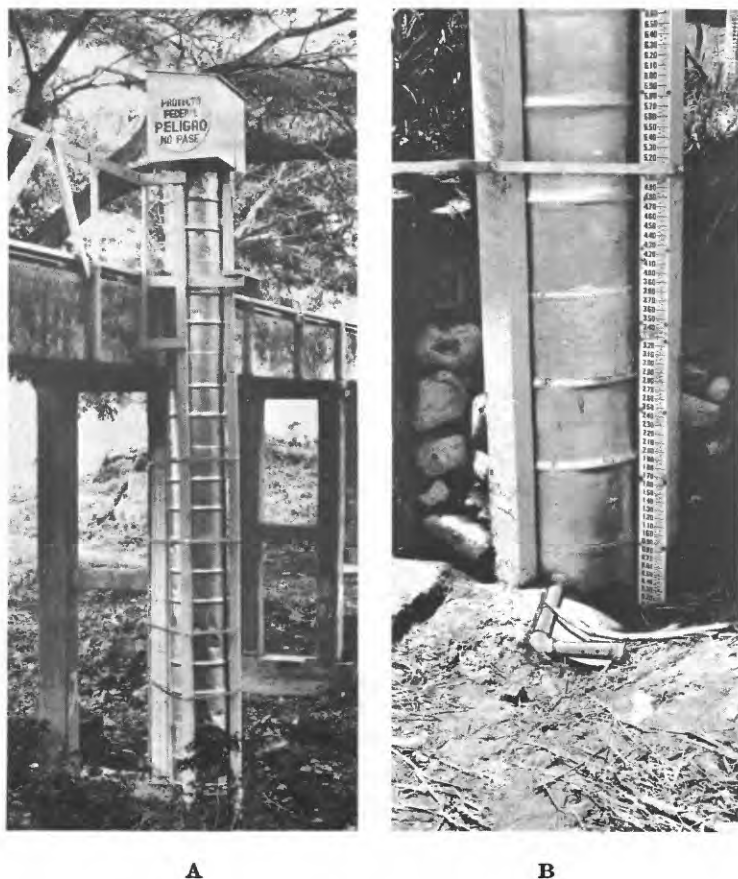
Stream-gaging wells in Puerto Rico constructed from oil drums. A, Typical installation on Quebrada (Creek) Cimarrón near Jobos; B, lower section of well, intake pipe with static tube to reduce drawdown, staff gage, and low-flow channel on Rio Guamani near Guayama.
